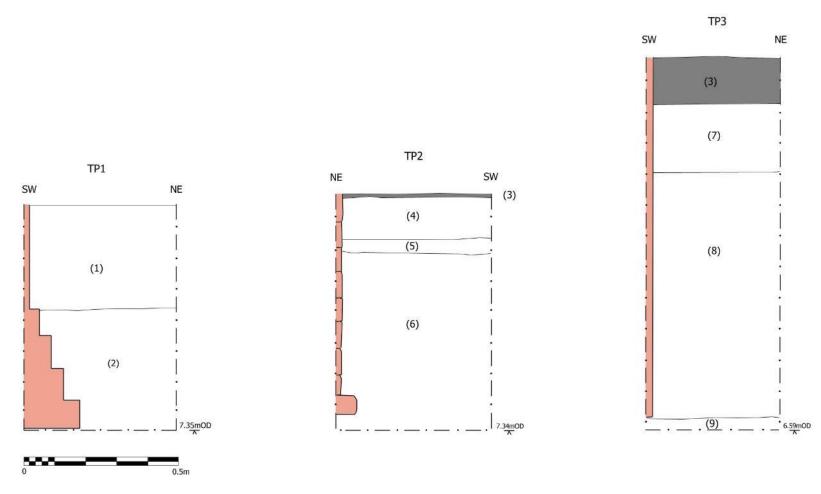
TP1 - NW facing section, with party wall foundation shown in red. TP2 - SE facing section, modern wall foundation shown in red. TP3 - NW facing section, party wall foundation shown in red. Originals drawn at 1:10.
